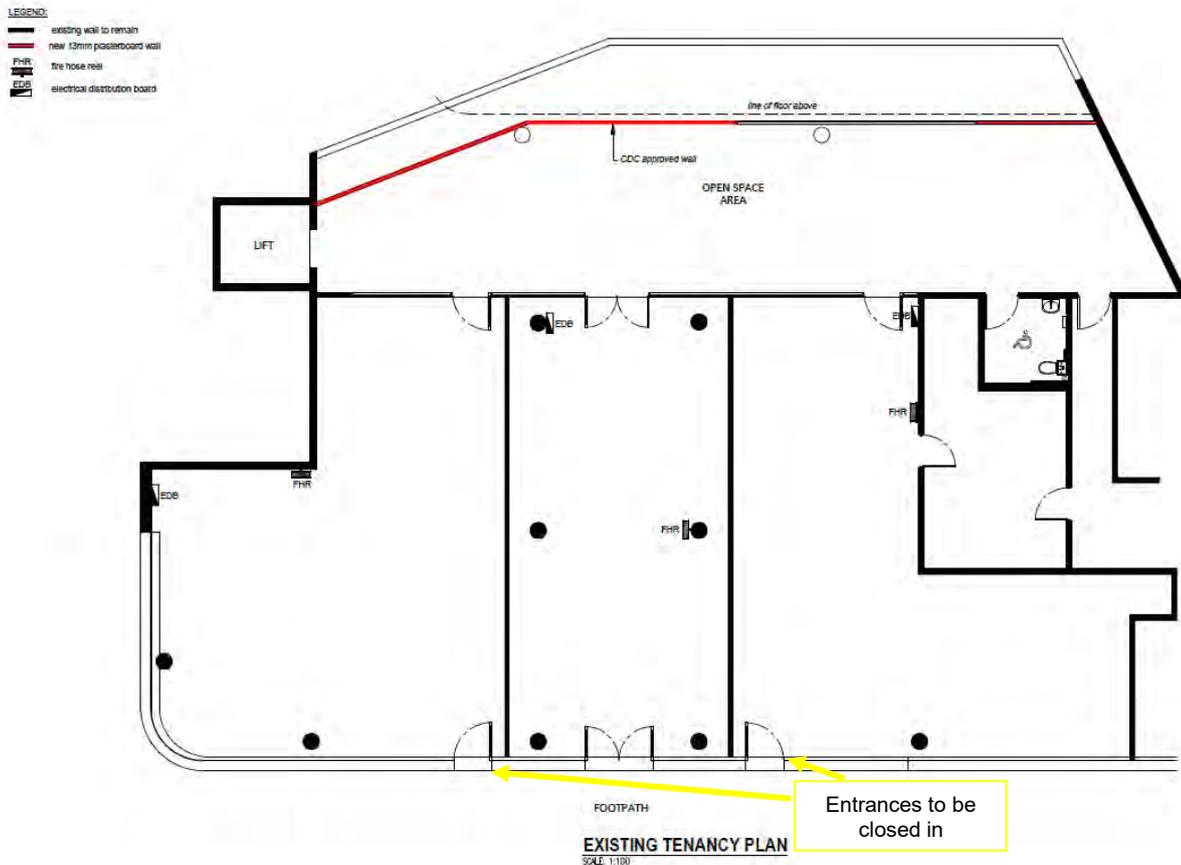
Existing tenancy plan (location of entrances to be removed shown in yellow)
